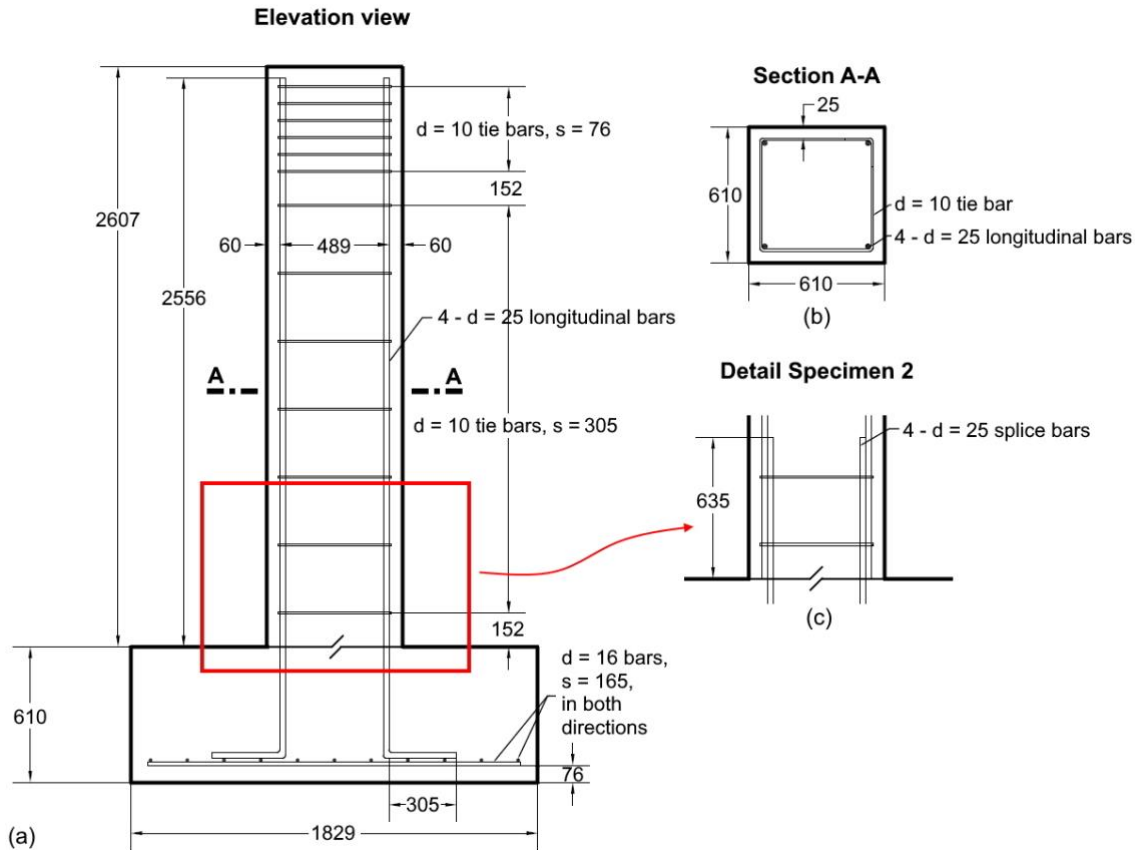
Drawings of RC column-footing subassembly test specimens: (a) Elevation view (Specimen 1 and 2), (b) Cross section (Specimen 1 and 2), and (c) lap splice detail Specimen 2. All dimensions in (mm).
